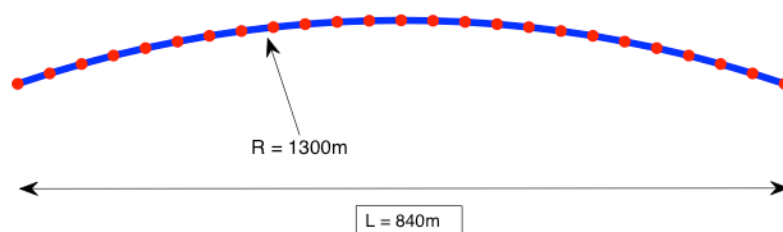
ARCH SHAPED FINITE ELEMENT MODEL OF BRIDGE SUPERSTRUCTURE
